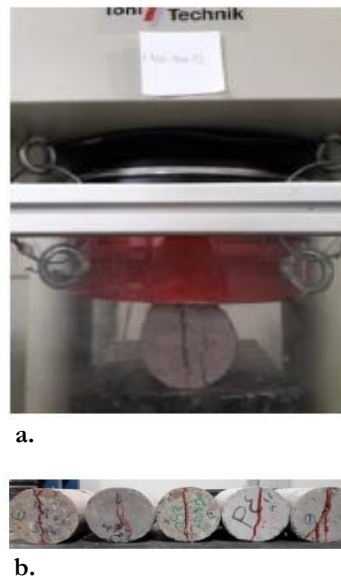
Tensile strength test of the Specimens: a. Specimen placement under the jack, and b. Crack development in the Specimens after the test.
